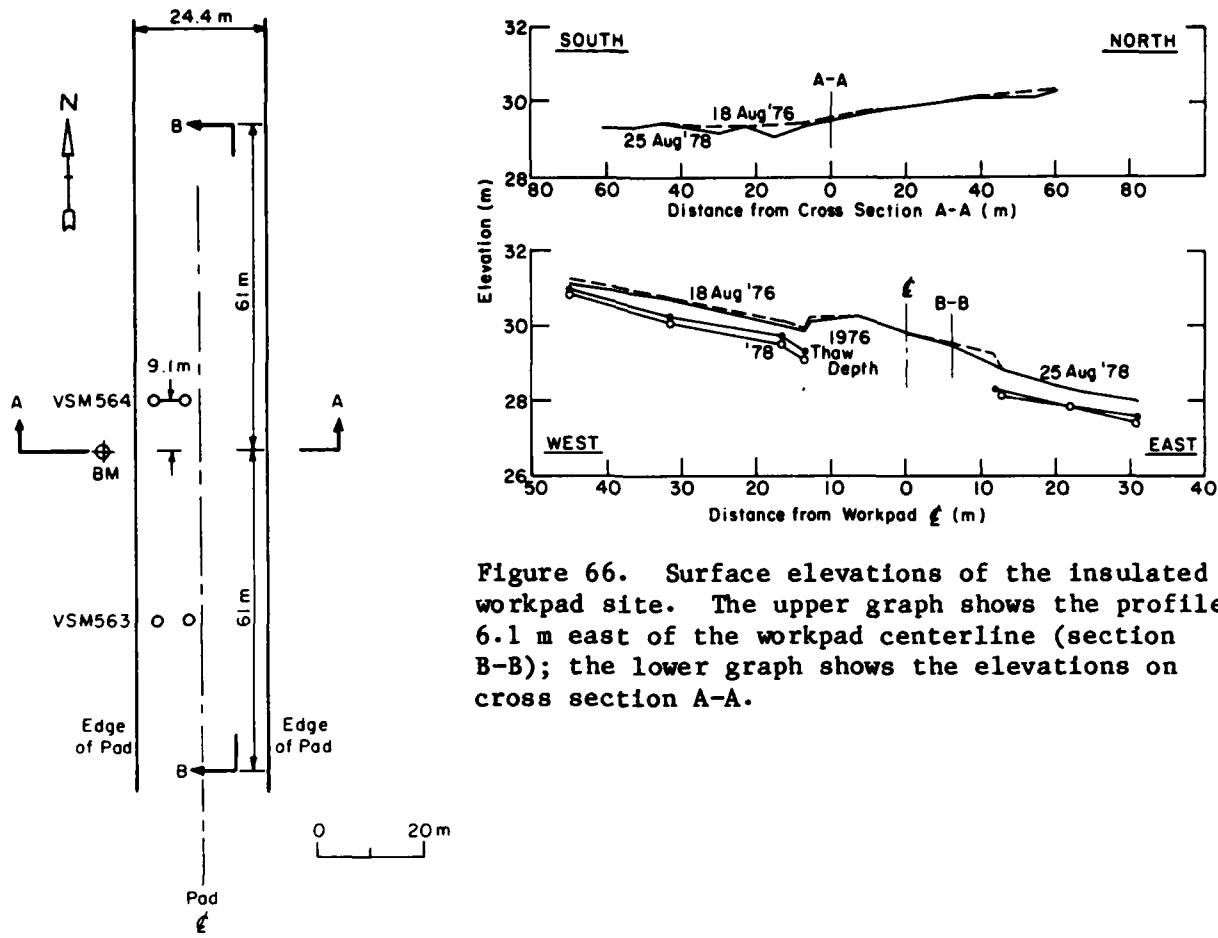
Surface elevations of the insulated workpad site. The upper graph shows the profile 6.1 m east of the workpad centerline (section B-B); the lower graph shows the elevations on cross section A-A.
